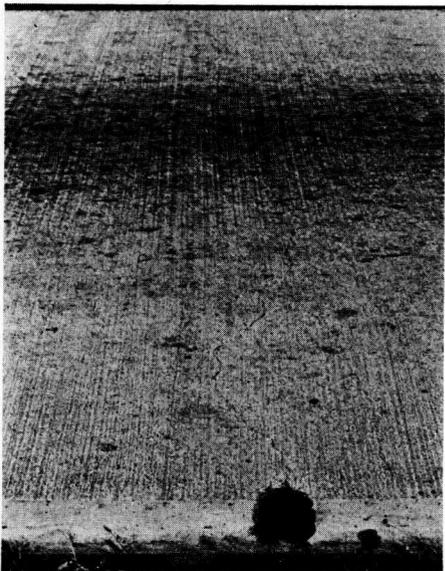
Present Condition of Typical Early Crack in Long Heavily Reinforced Section
